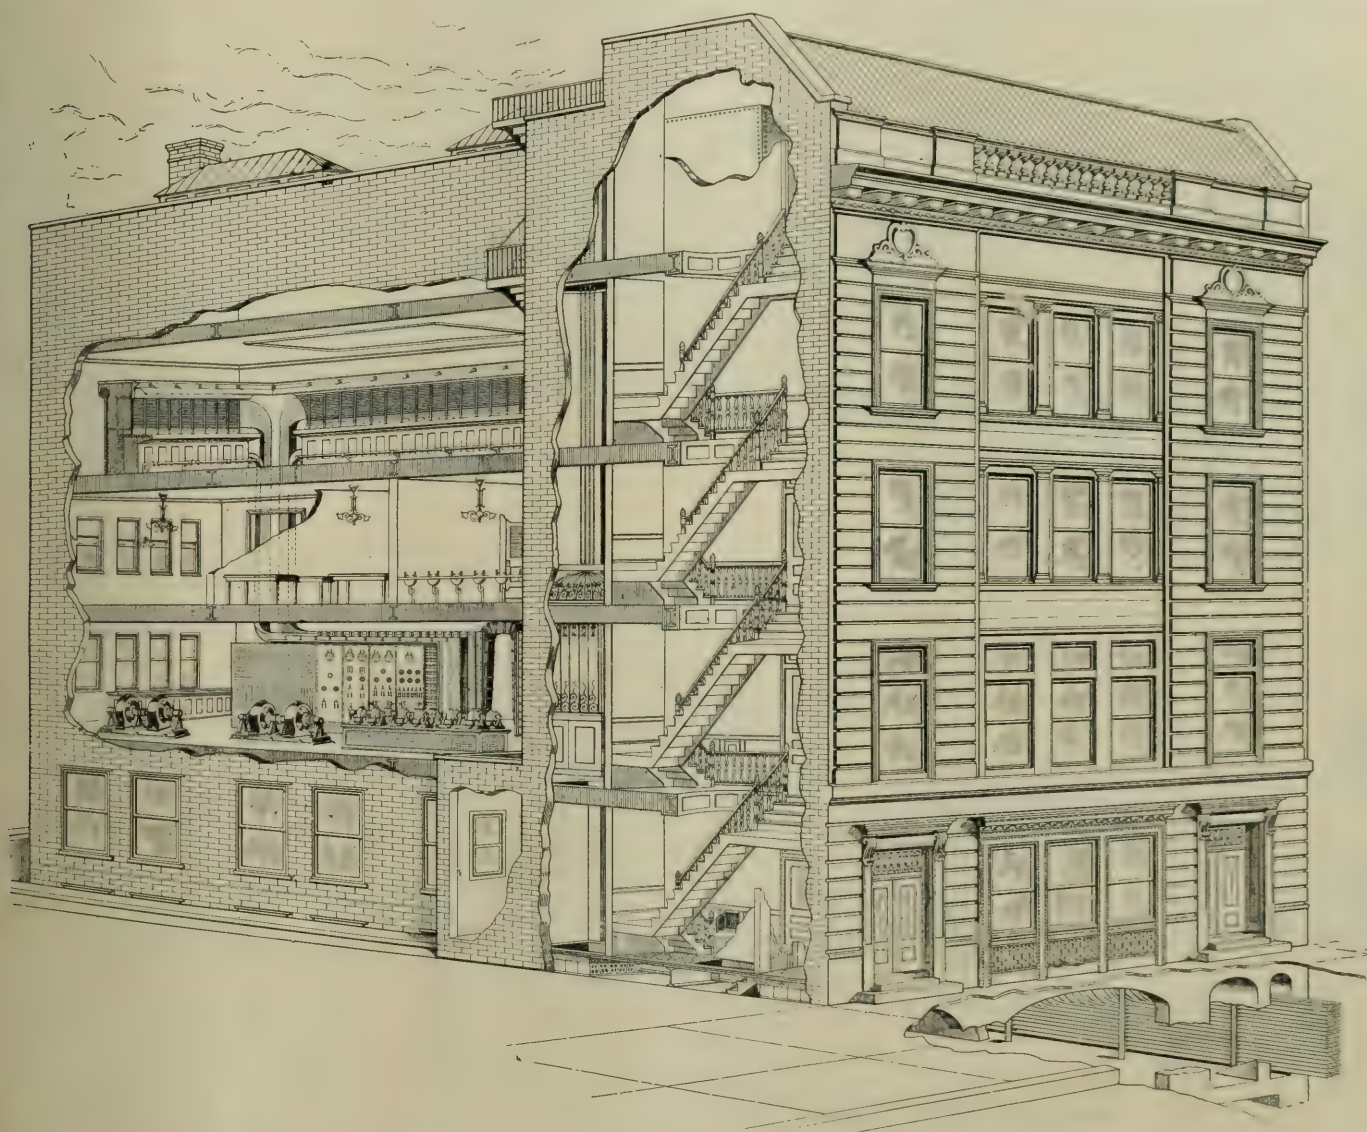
PLAZA CENTRAL OFFICE BUILDING, NEW YORK, SHOWING INTERIOR ARRANGEMENT.
